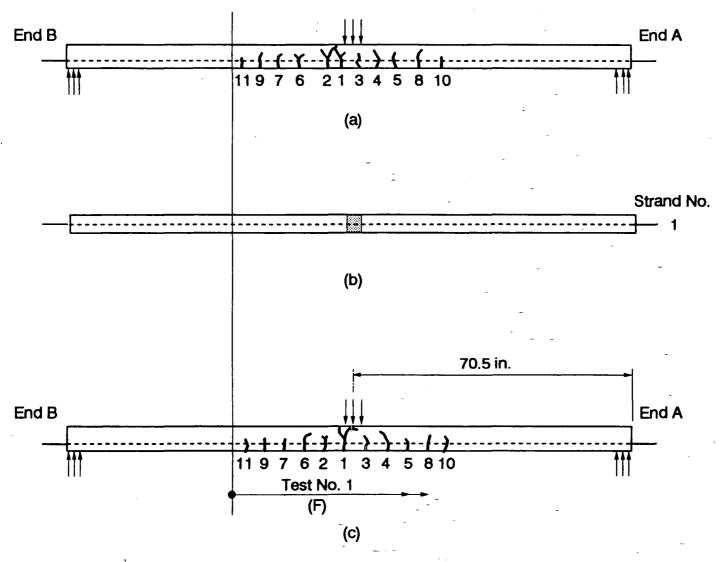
Crack pattern for D-type Specimen No. 10-6.0DU-1:
